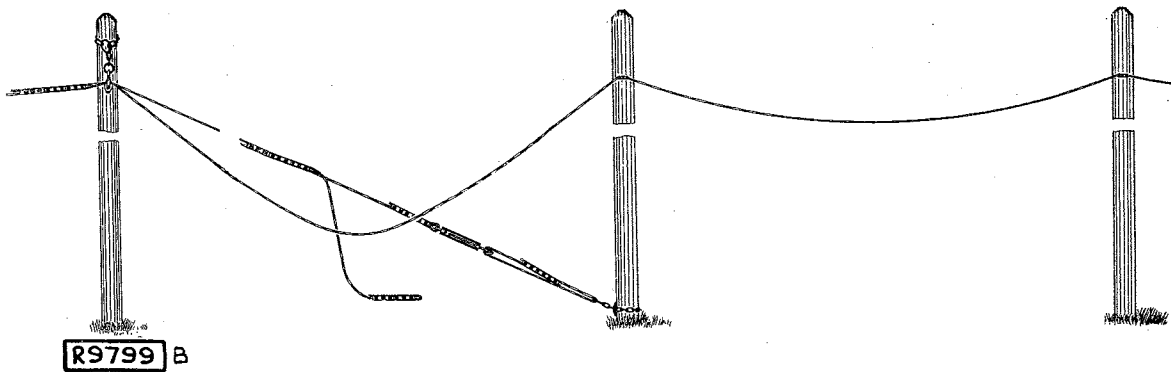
By-passing tail taking load, next length of wire run out to next tensioning point
